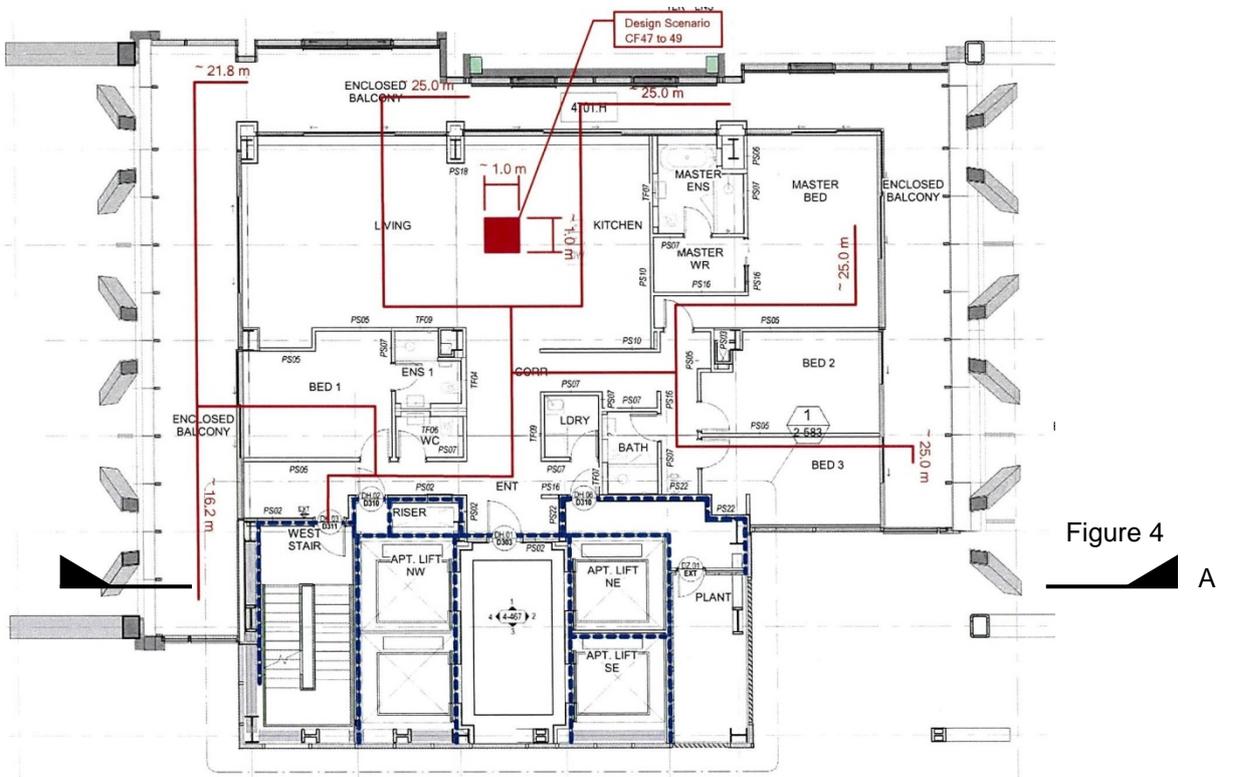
Plan L47 – showing ‘full floor’ apartment with no connecting lobby between the lifts and West stair (not to scale)
